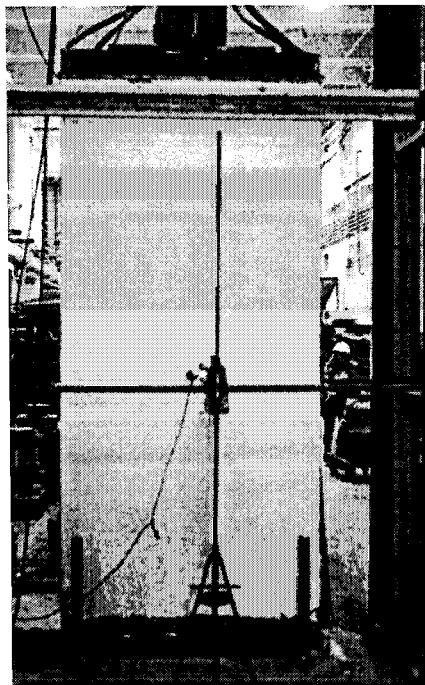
First transverse crack in cement skin at 5.5 kPa wind pressure
